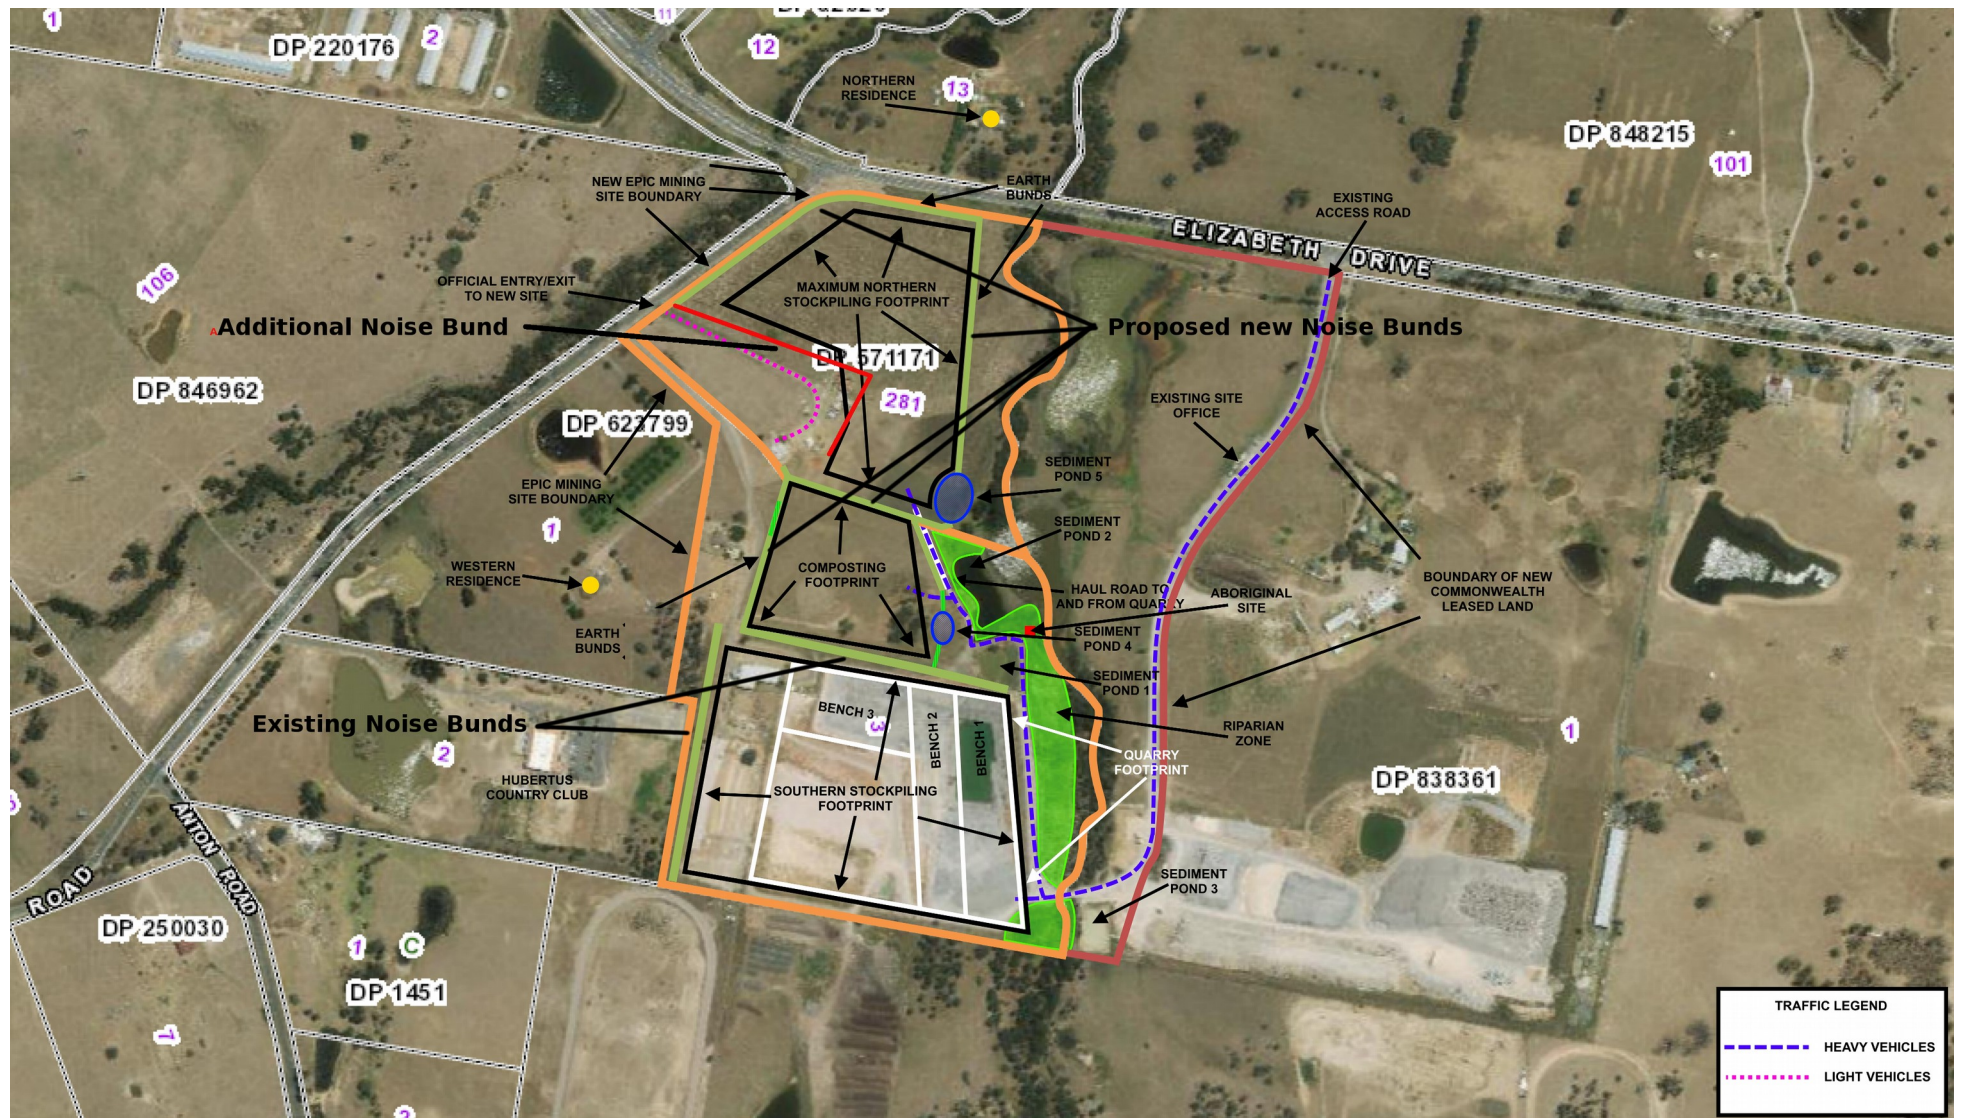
Proposed northern stockpile area, composting area, pit layout, existing, proposed and additional noise bunds
